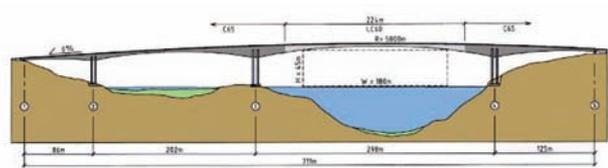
Elevation of Raftsundet bridge in Norway [2]
